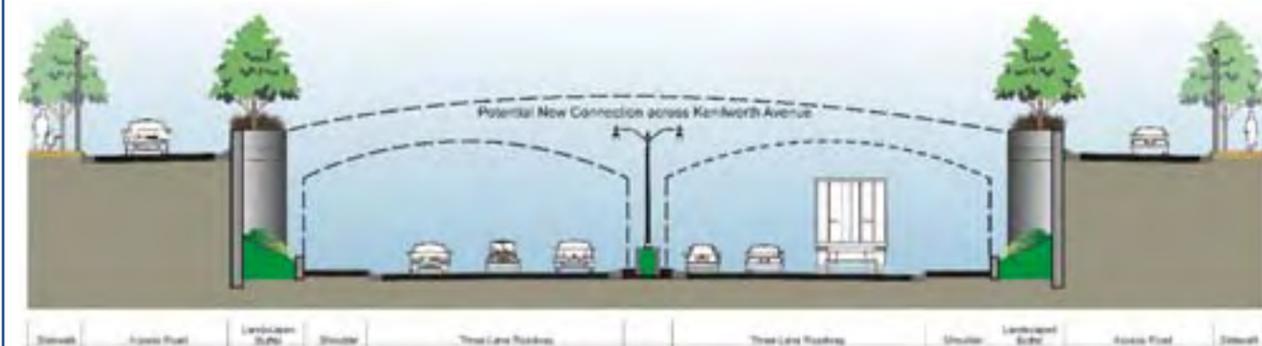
Cross-Section Between East Capitol Street and Eastern Avenue (Kenilworth Avenue depressed to provide new connection)
